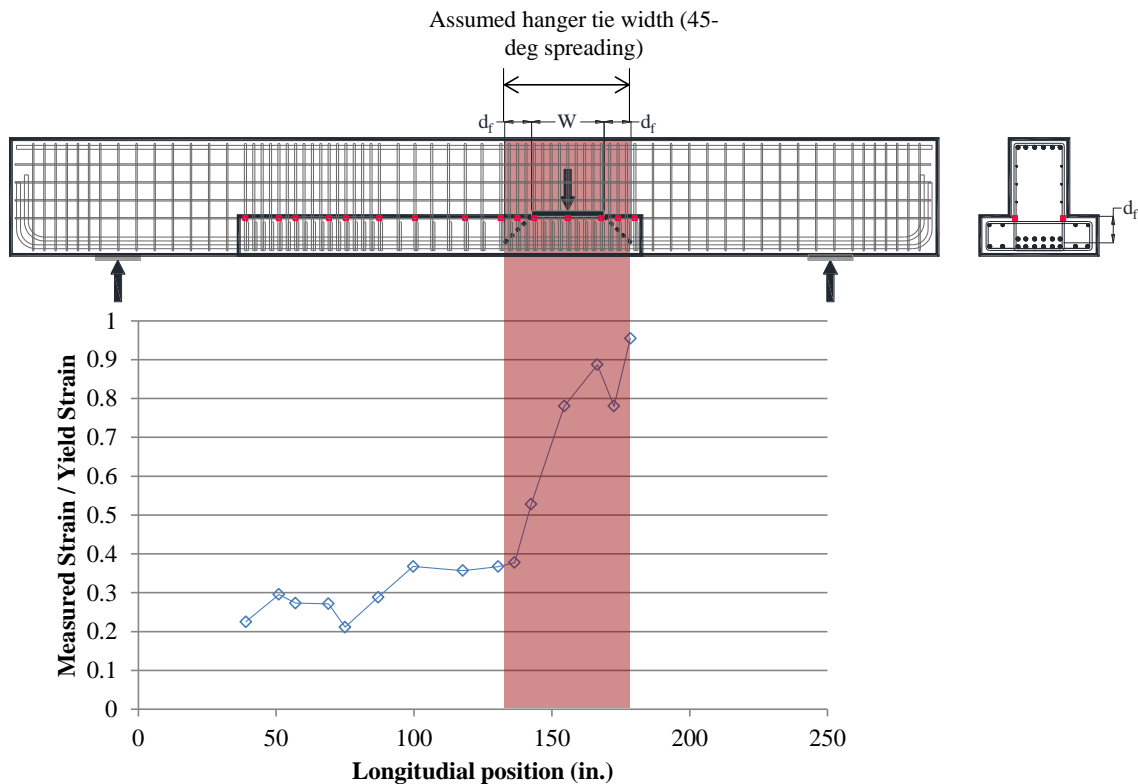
Typical hanger strains at failure (specimen 16a: SS1-42-2.50-03); one point load test, shallow ledge
